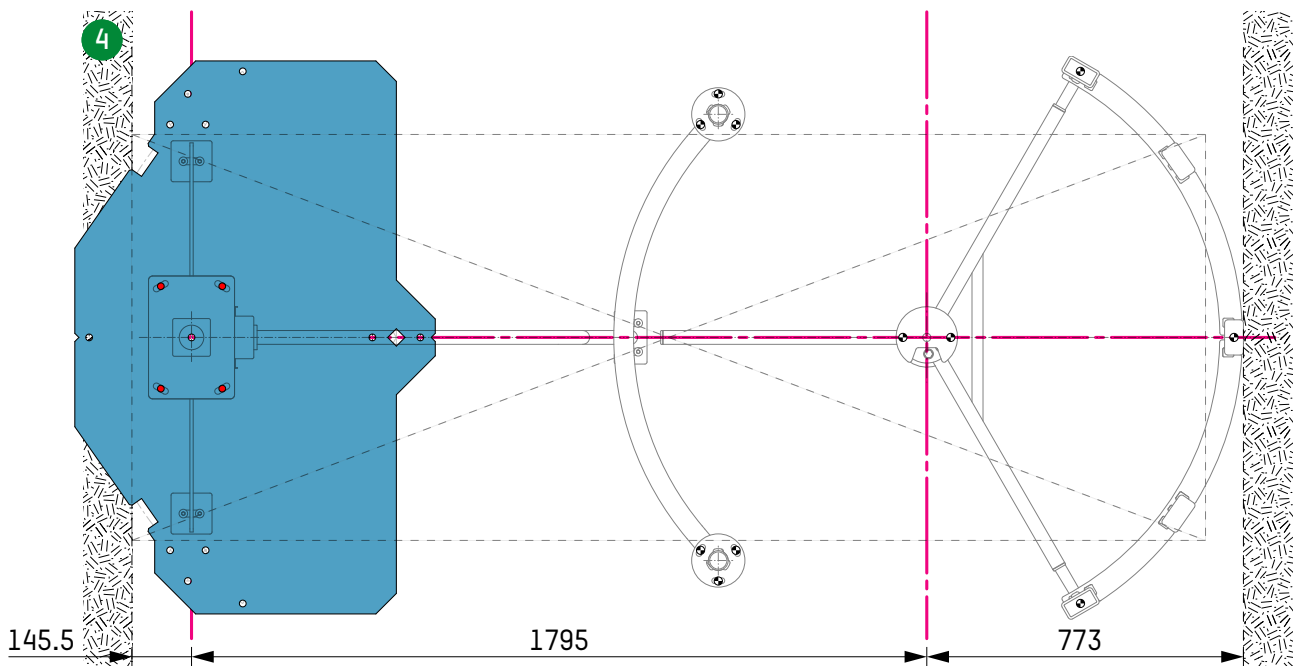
Drilling template (GAB-E-0113963) - Drawing the BIKE fixing points (Step 4)
